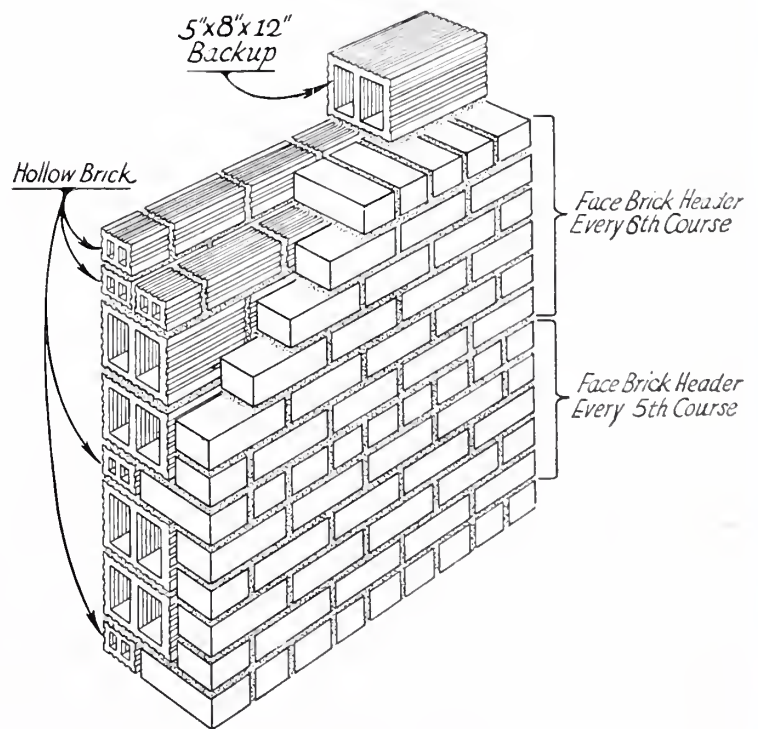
Twelve-inch brick veneer load bearing wall, using 5"x8"x12" backup material as backing and hollow brick to provide header bond.
